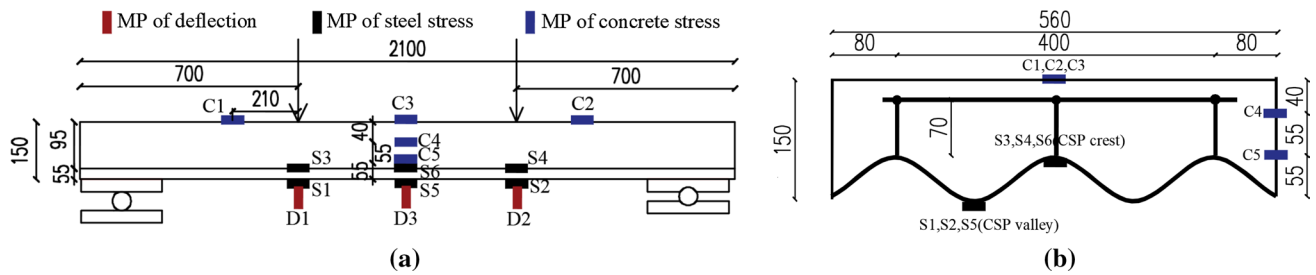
Measuring point (MP) arrangement of the plate (mm). a Vertical section. b Cross-section
